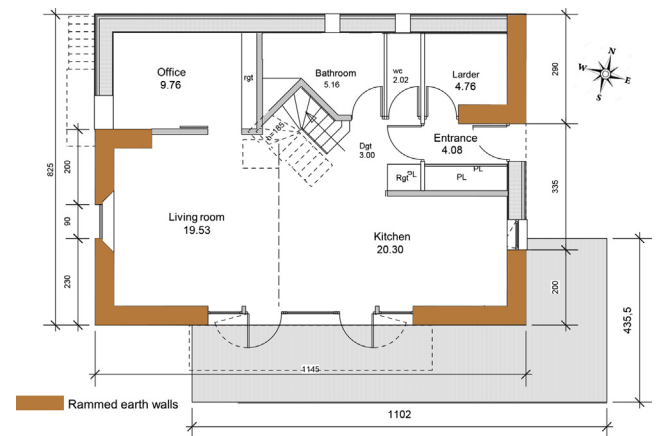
Home plan for the ground floor, with the four rammed earth walls.
